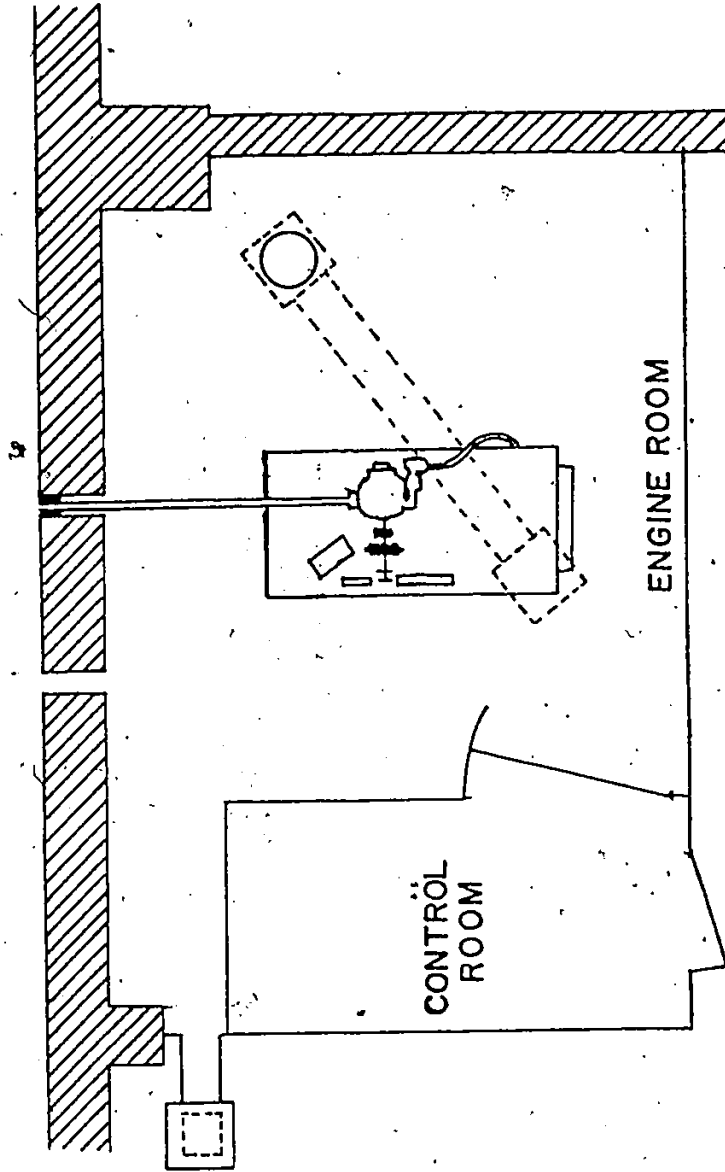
SKETCH OF ENGINE LABORATORY LAYOUT
